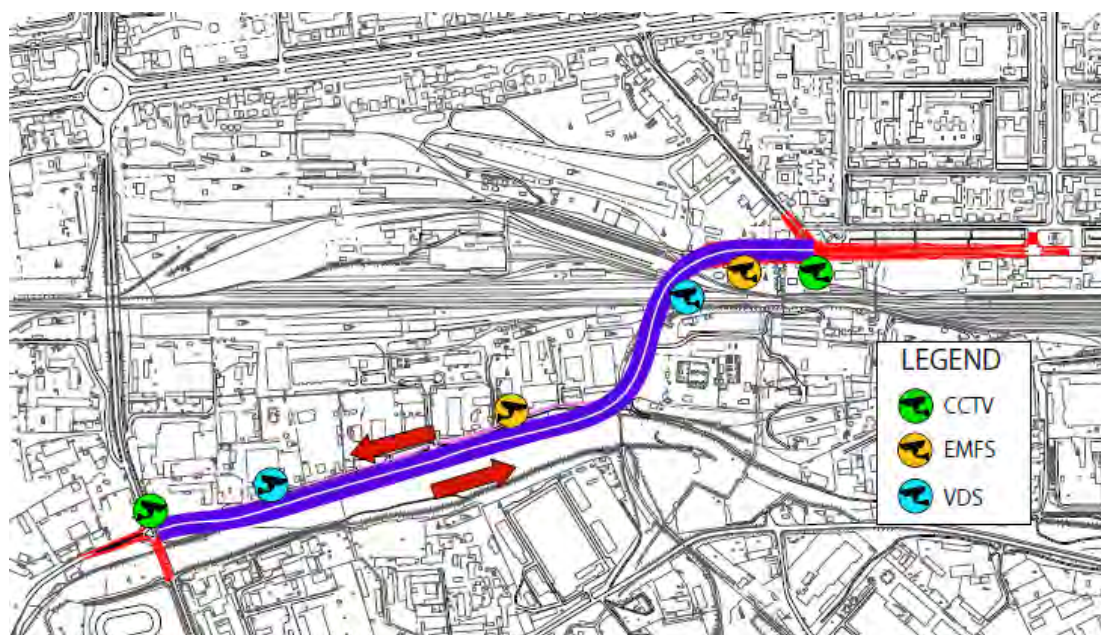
Proposed Location for Installation of ITS Equipment
